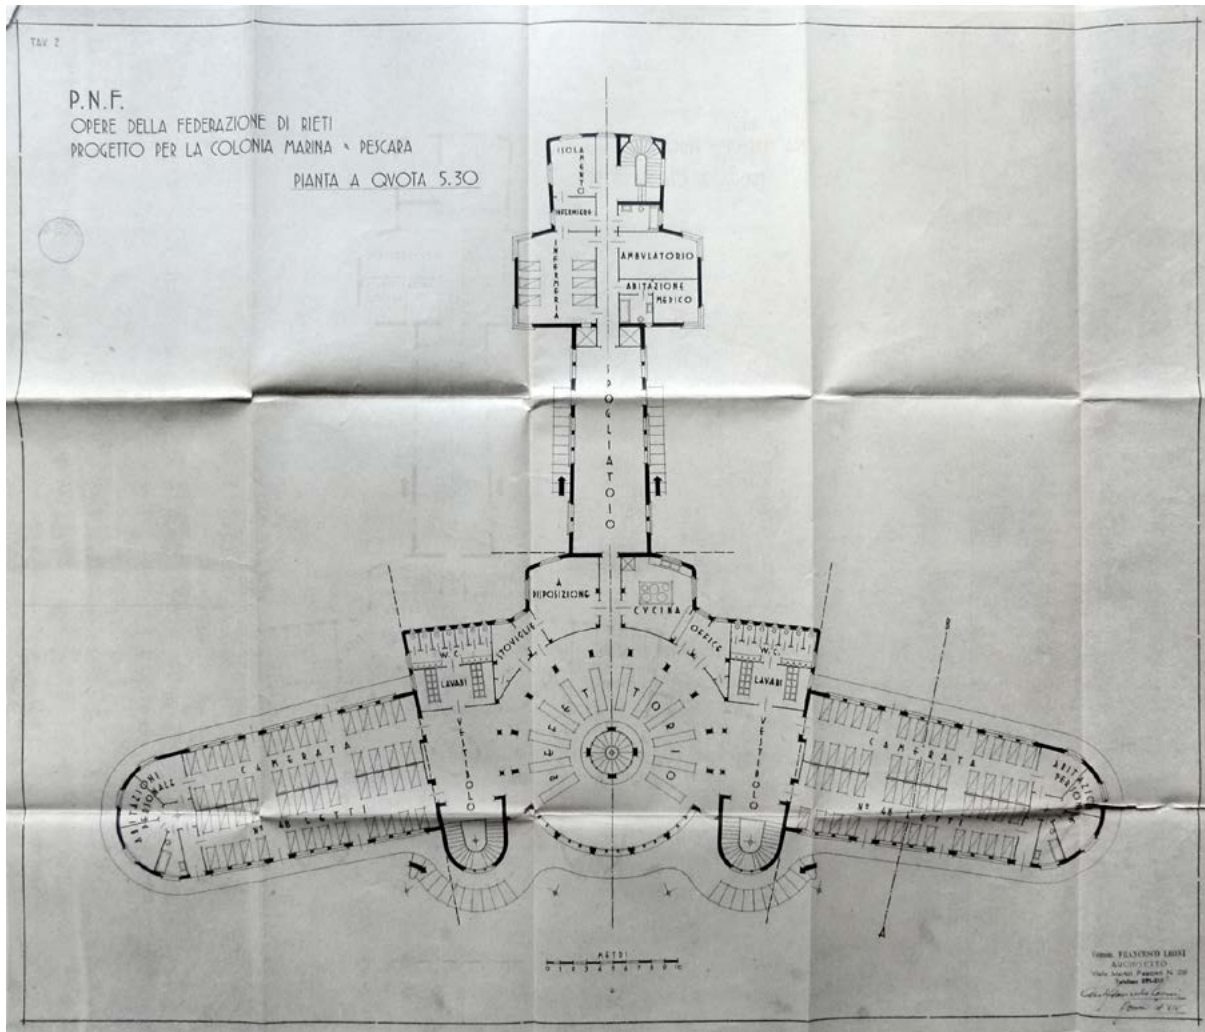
Montesilvano (PE), Colony Stella Maris. Planimetry of the first floor of the building (Rome, ACS,PNF, Servizi Vari, serie II, b. 1368).
